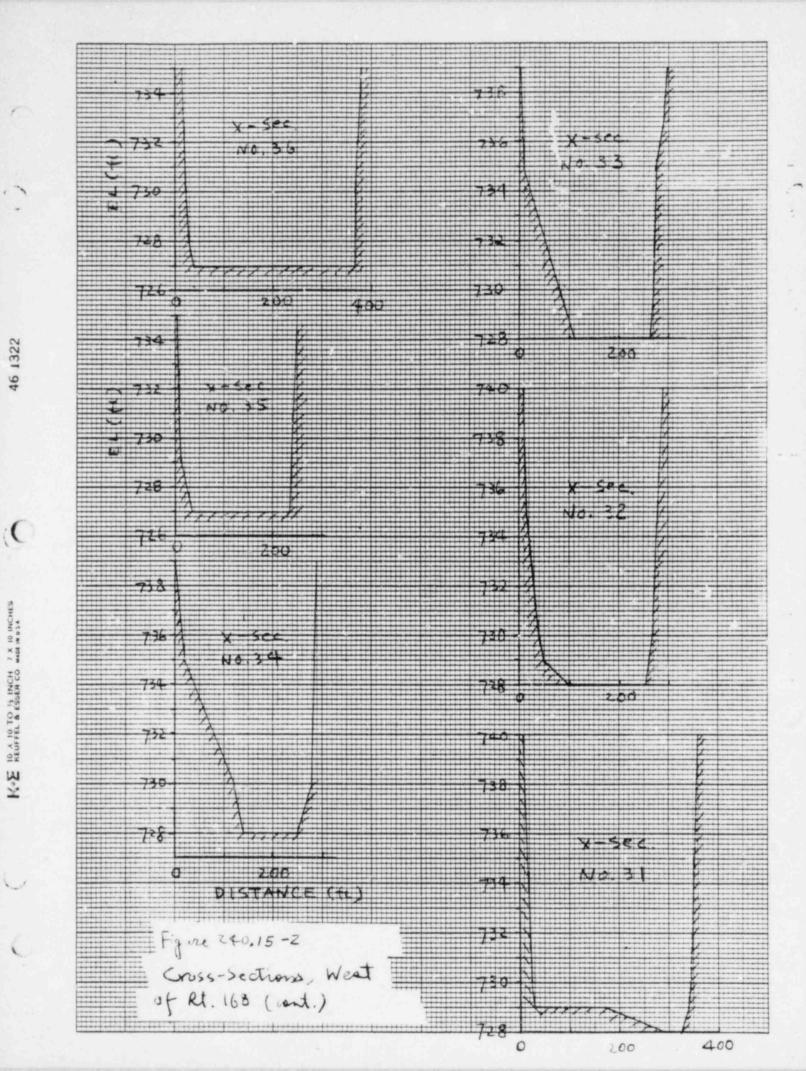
CROSS-SECTIONS, WEST OF RT. 168
